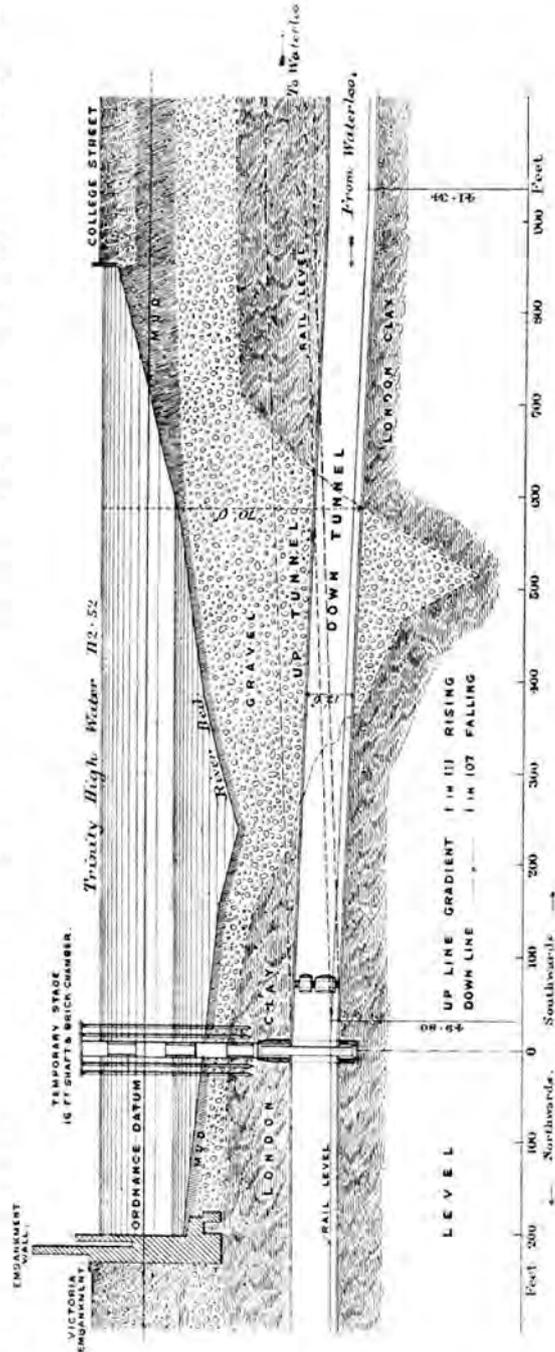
BAKER STREET AND WATERLOO RAILWAY, LONDON.
